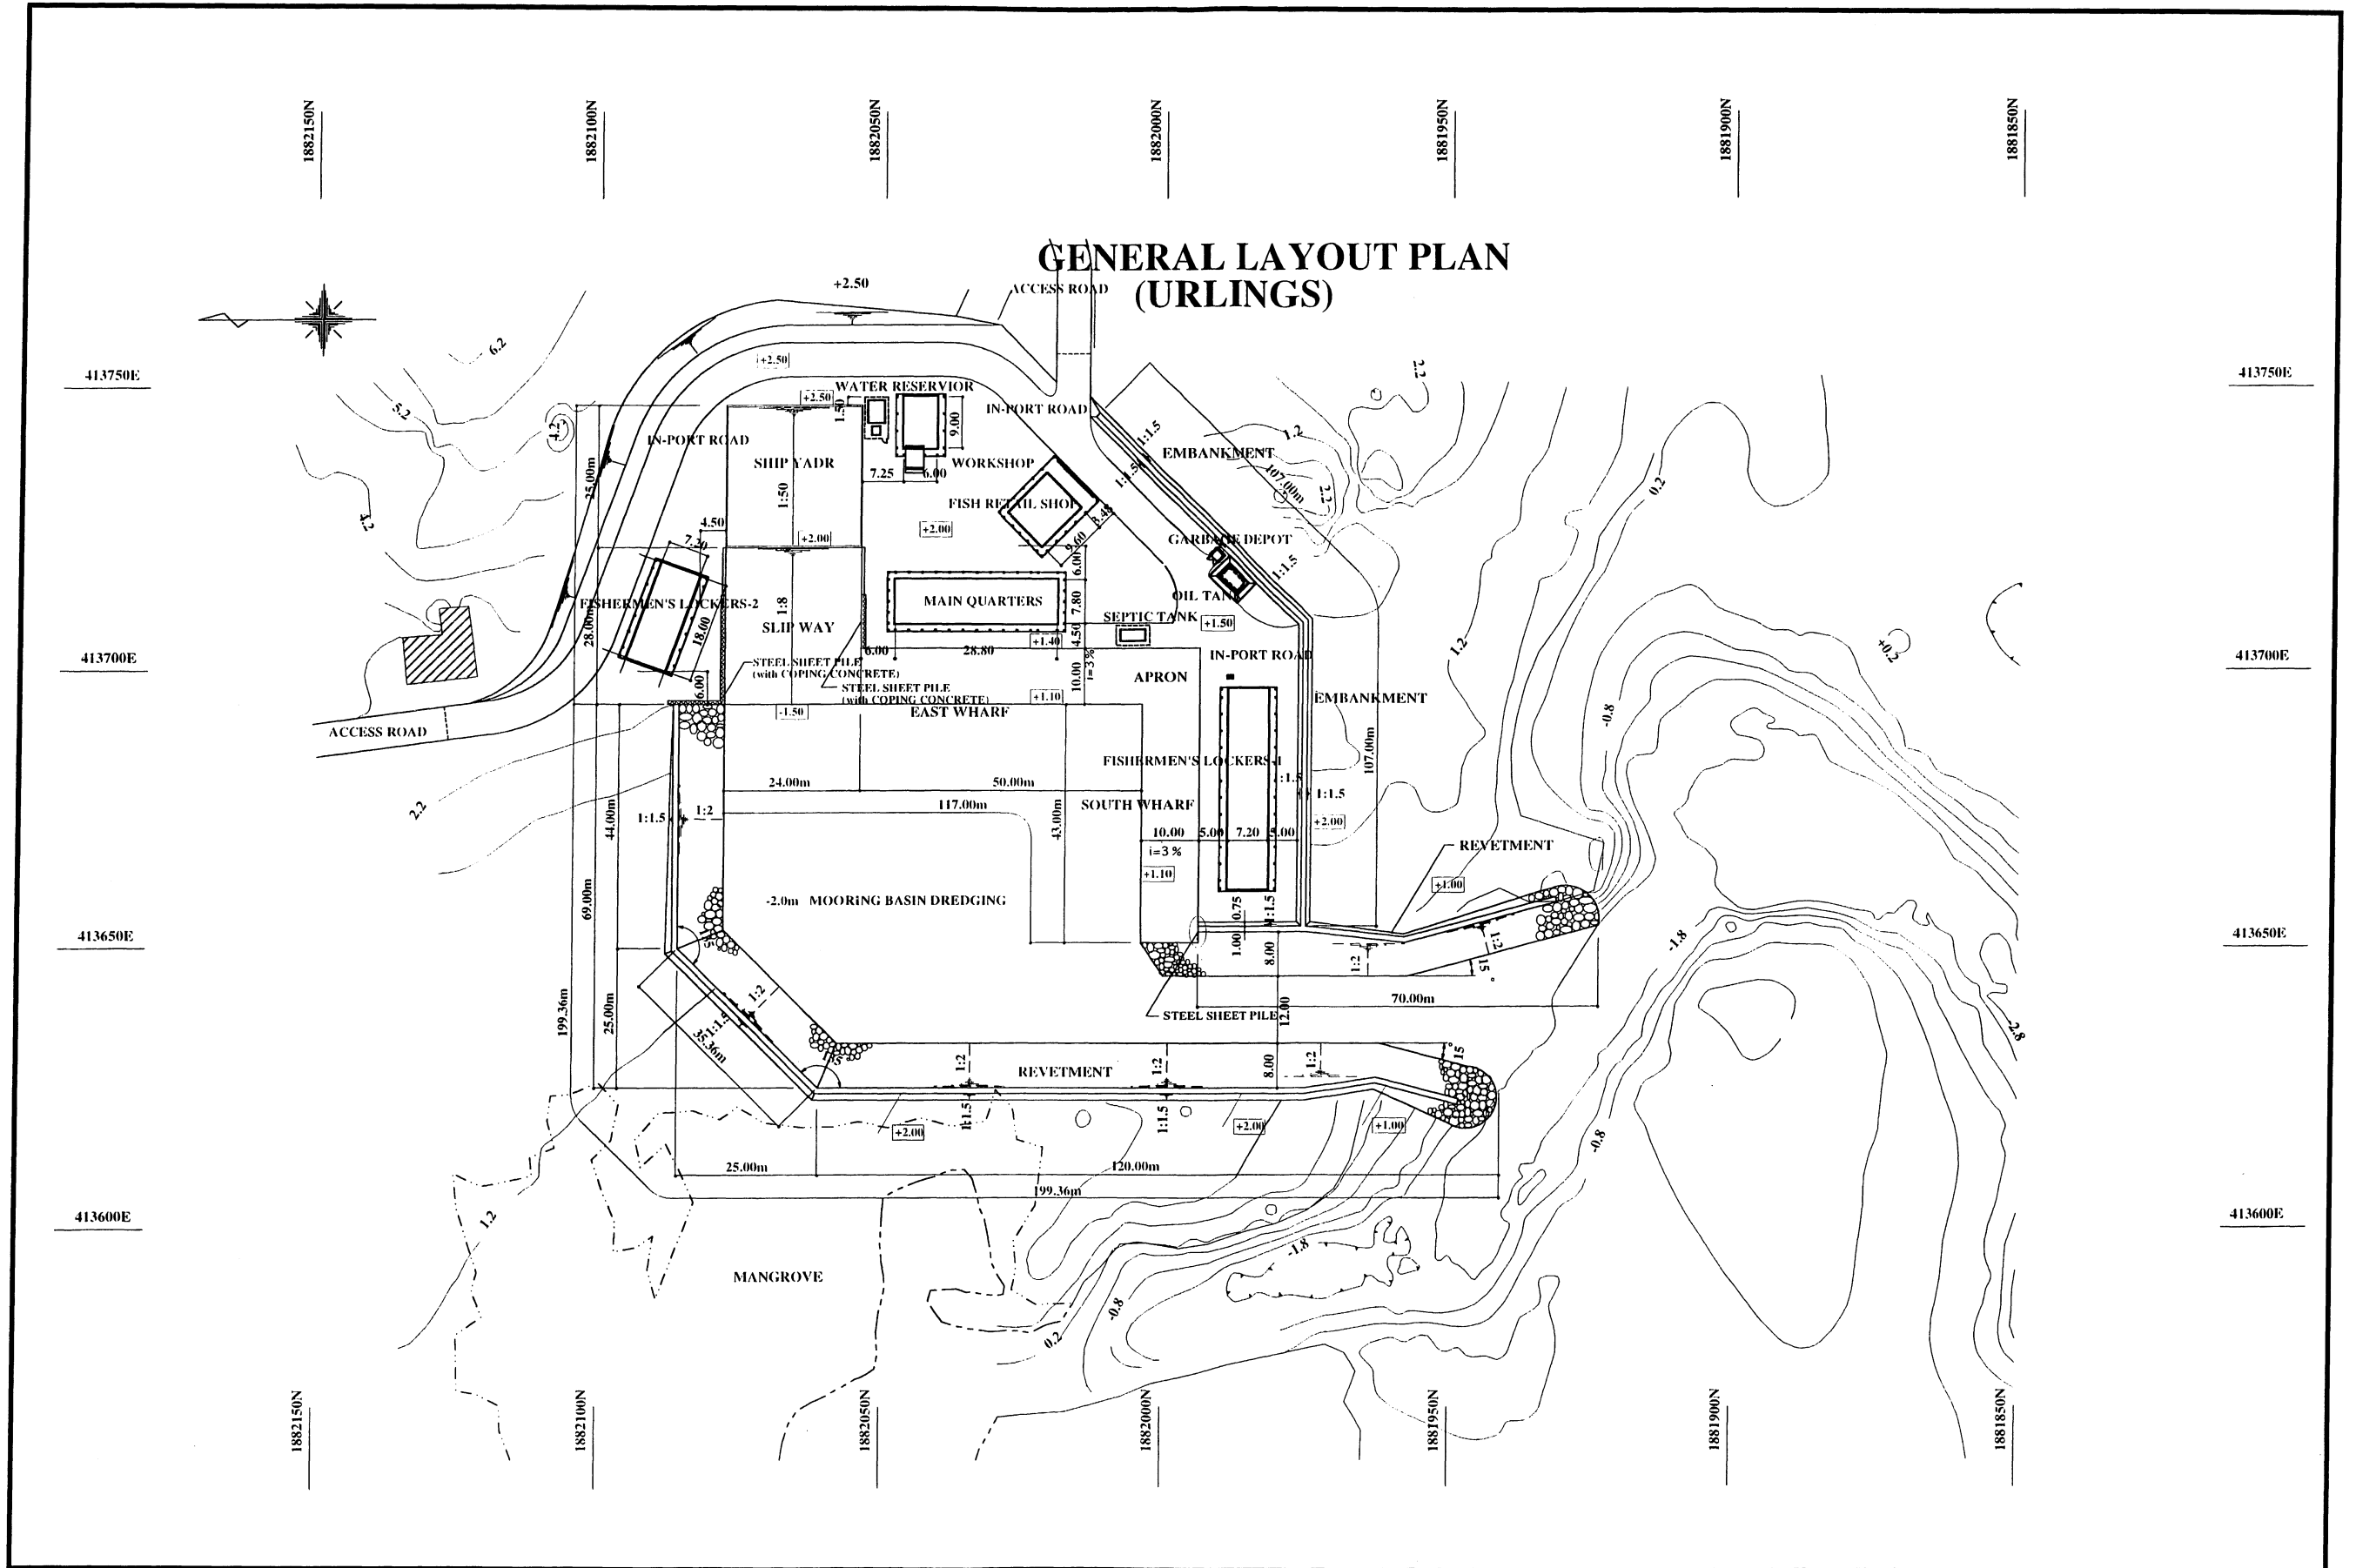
Overall Layout Plan (Urlings)
